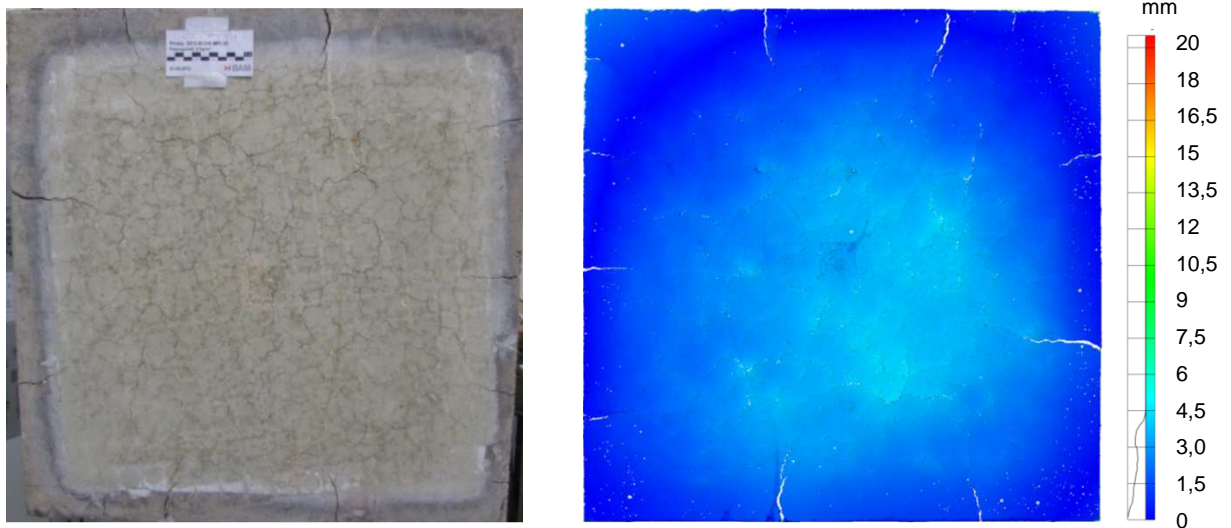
DFG-B32/6 - MFI25 – 2 kg/m³ - spalling volume 0%, only cracks and deformation
